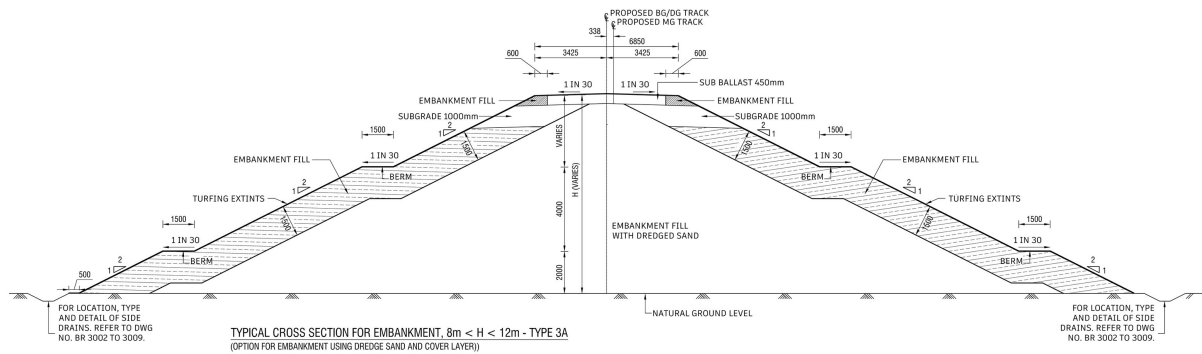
Typical cross section for embankment height 8 m to 12 m (Type 3A).
